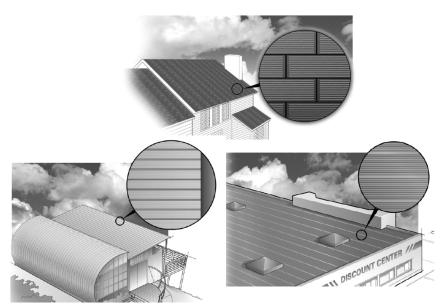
New flexible solar modules are integrated, rather than installed, into existing or new buildings (adapted from Konarka).
